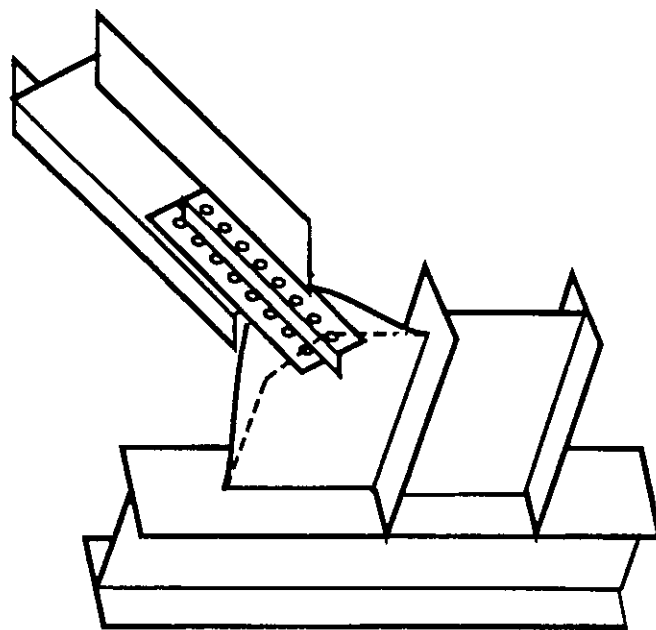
Actual Braced Frame Behavior: Bracing
